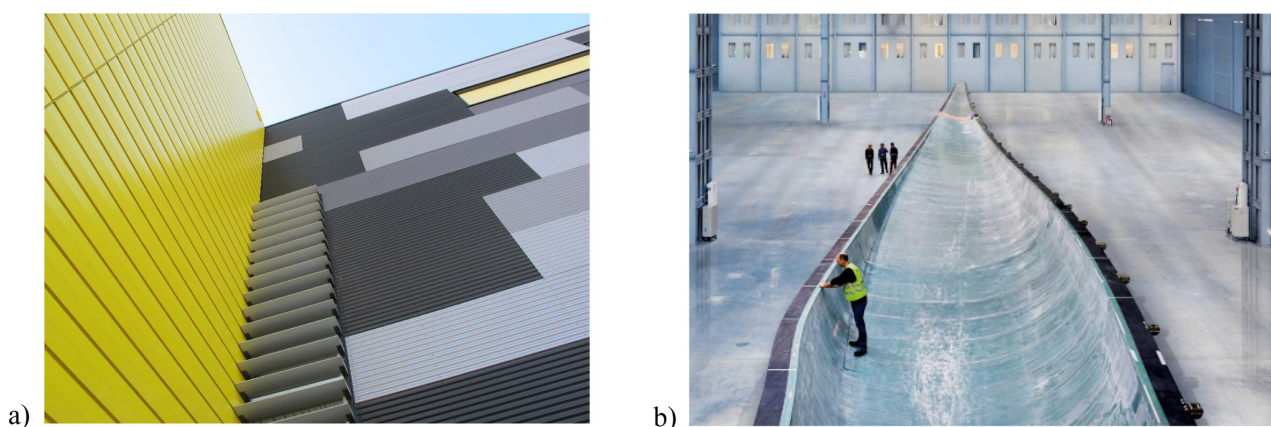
Examples of galvanised steel in construction a) Sandwich panels made from pre-painted galvanised steel strip with a thick PIR foam core; b) Tata Steel, the UK's largest steelmaker, has supplied Celsius® high-strength structural hollow sections to help create a vast new extension to the off-shore wind turbine blade factory in Hull for Siemens Gamesa
